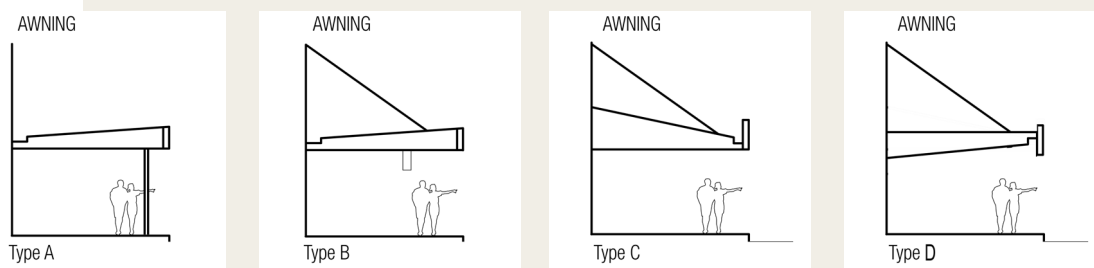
Typical awnings styles within the Murwillumbah Main Street HCA.
